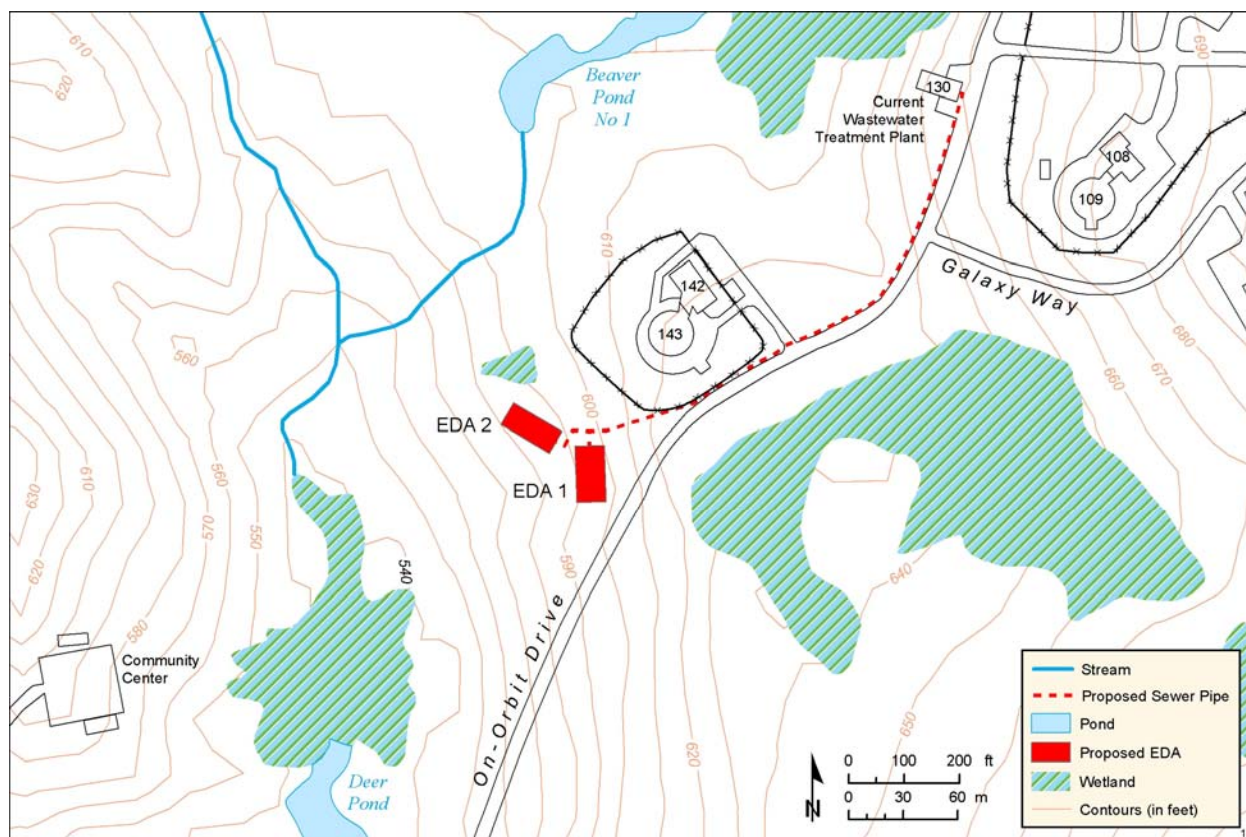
Detail of the Proposed Septic System Project Area at New Boston Air Force Station, New Hampshire.
